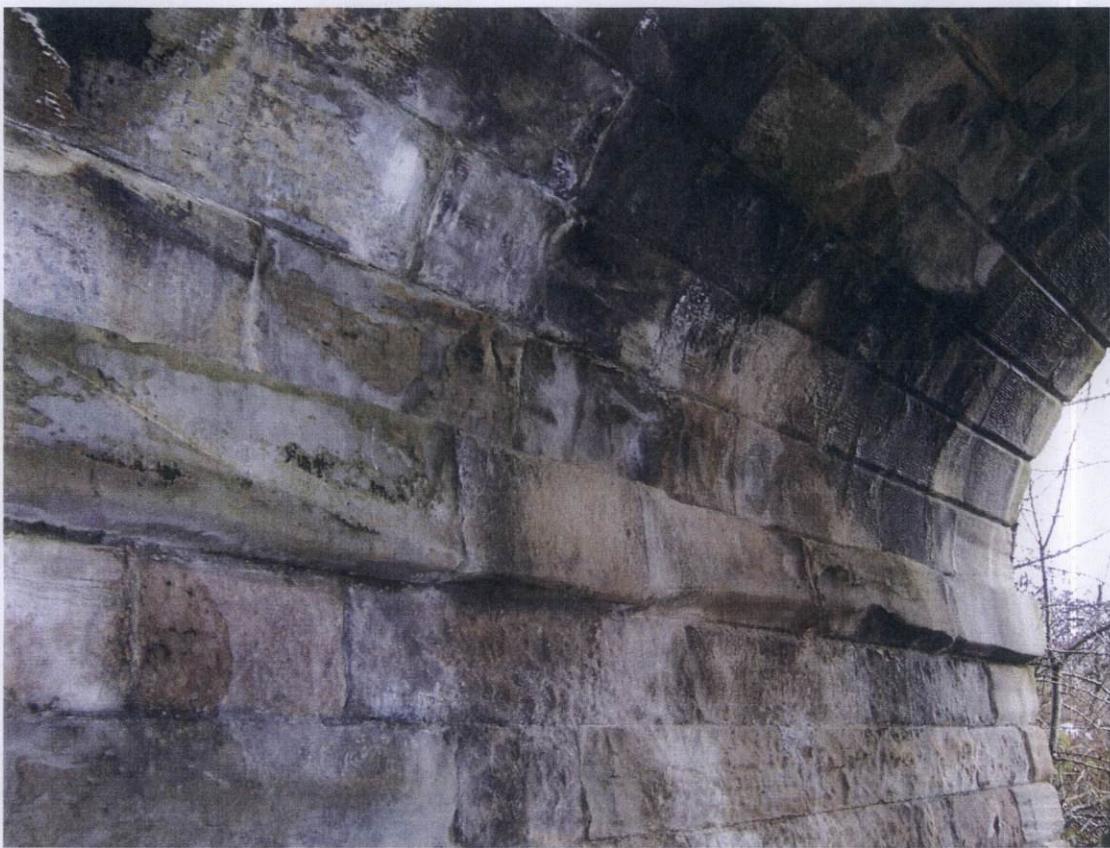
North arch, north abutment. Crack. Tell-tale positions circled.
